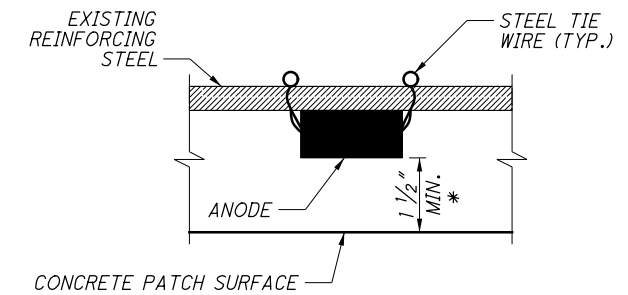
ANODE BESIDE EXISTING REINFORCING
